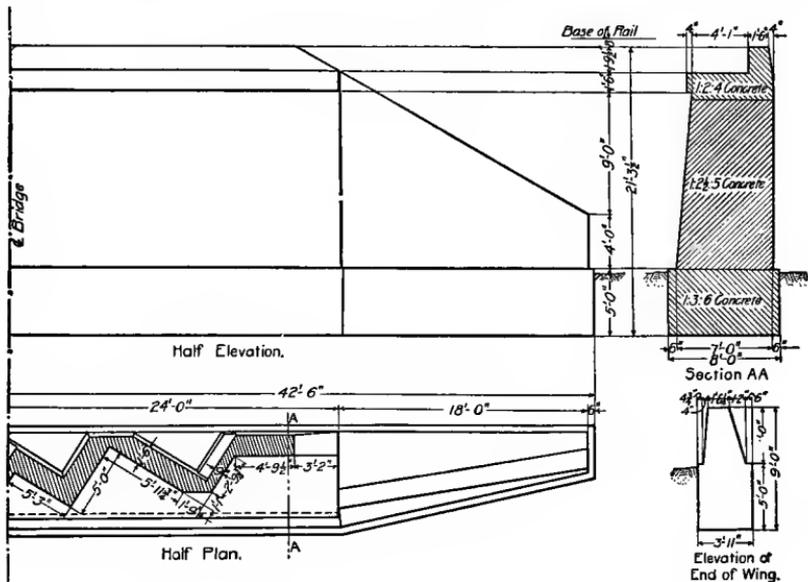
STRAIGHT SKEW ABUTMENT. LEHIGH VALLEY RAILROAD.
